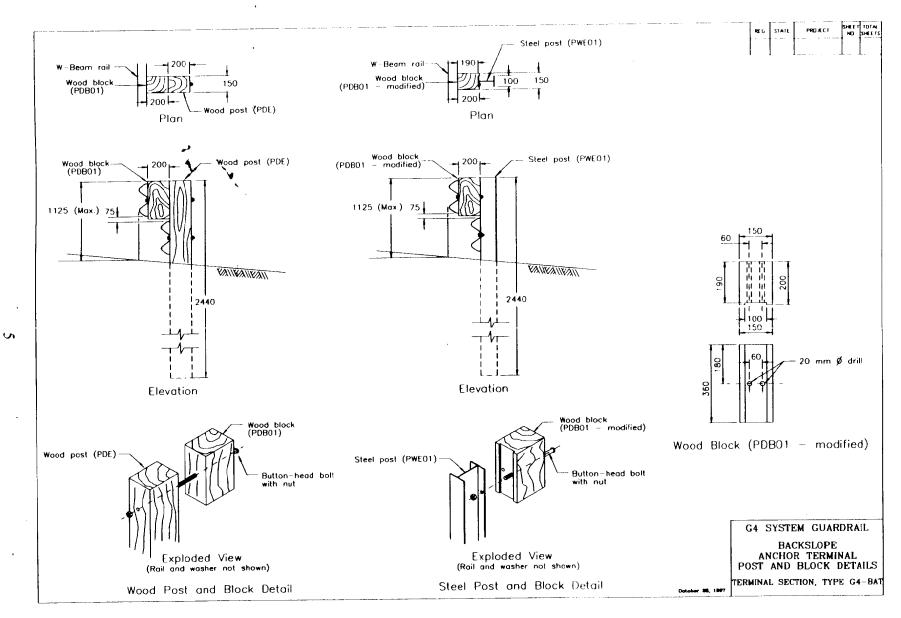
Post and block details for the G4 W-beam guardrail buried-in-backslope anchor terminal.
